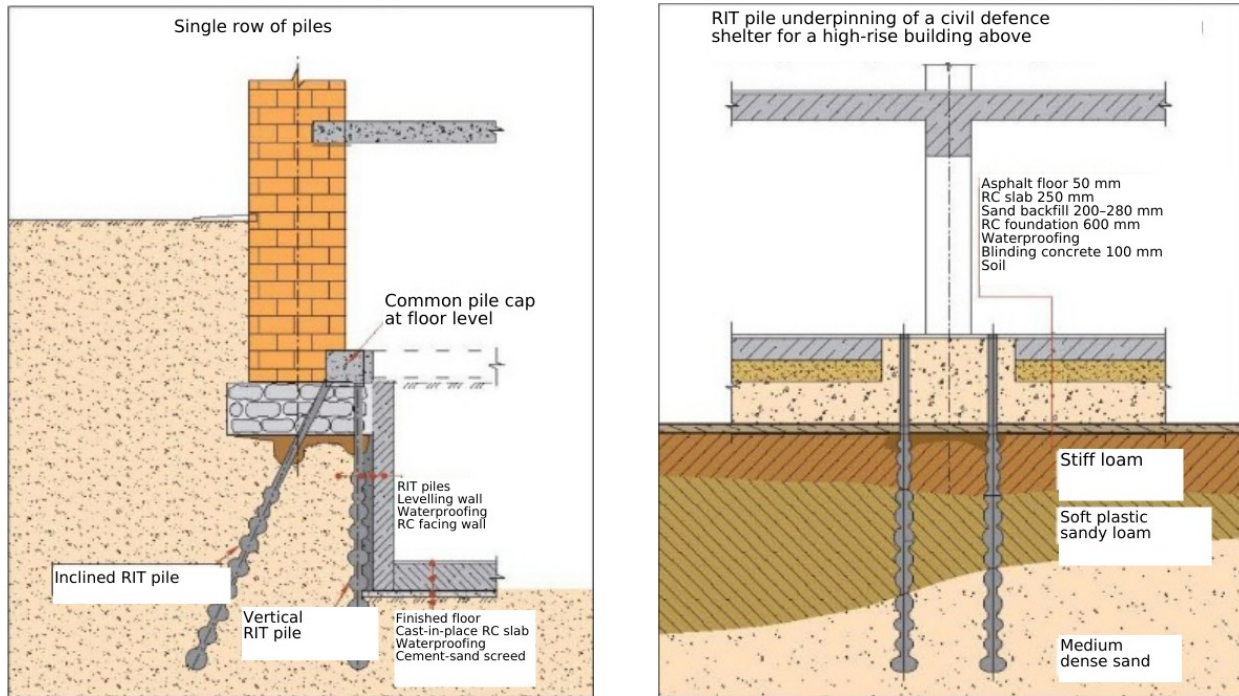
Basement deepening by 3 m using RIT injection piles, with a common pile cap at floor level.
